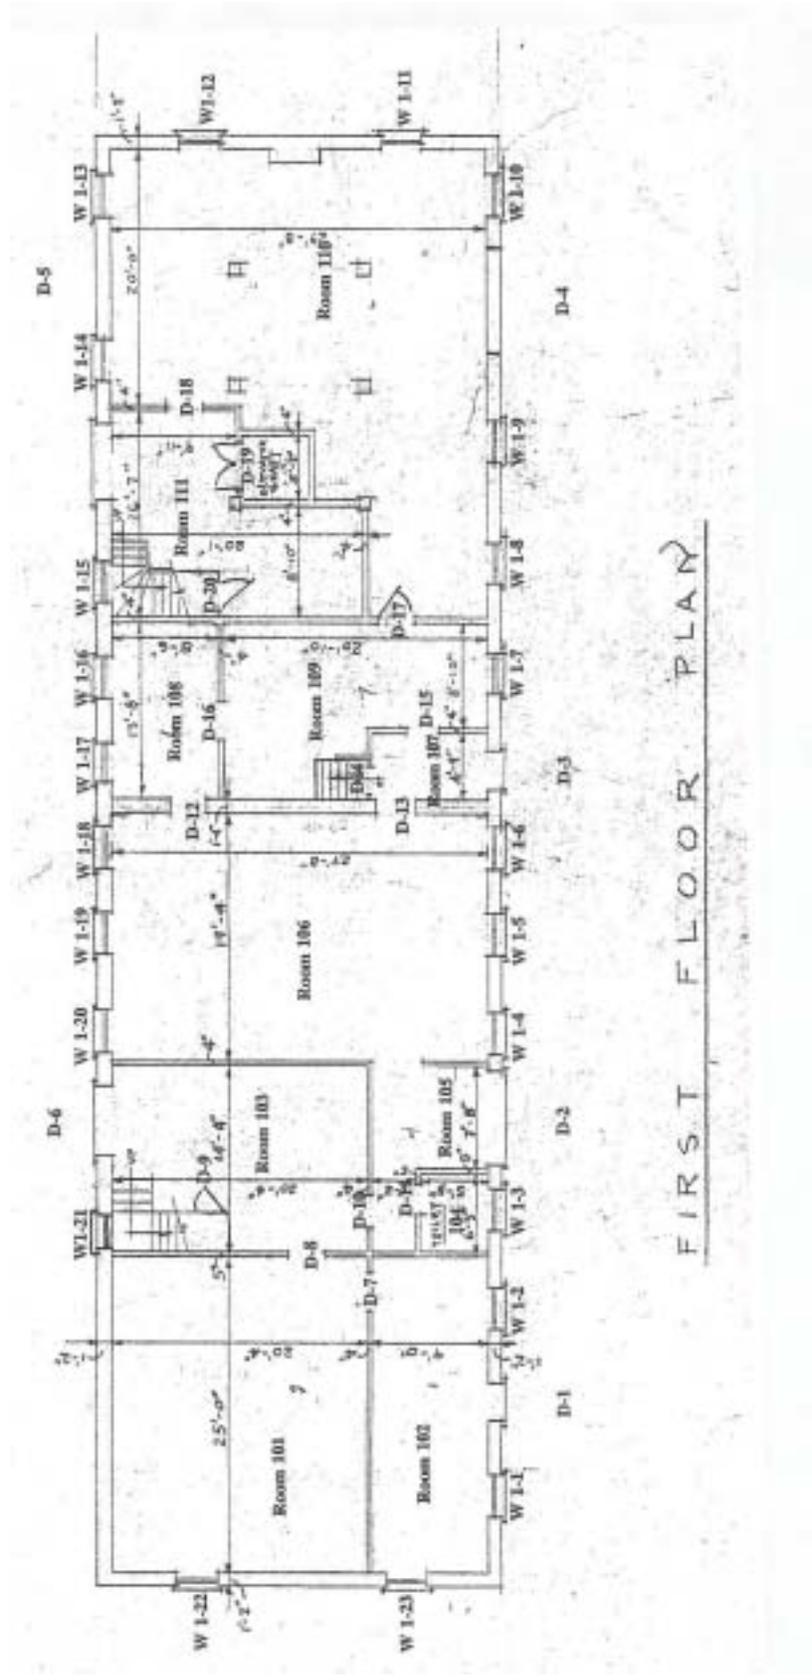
First-floor plan of Building 32, showing scheduled rooms and openings [1960; annotated 1993].
